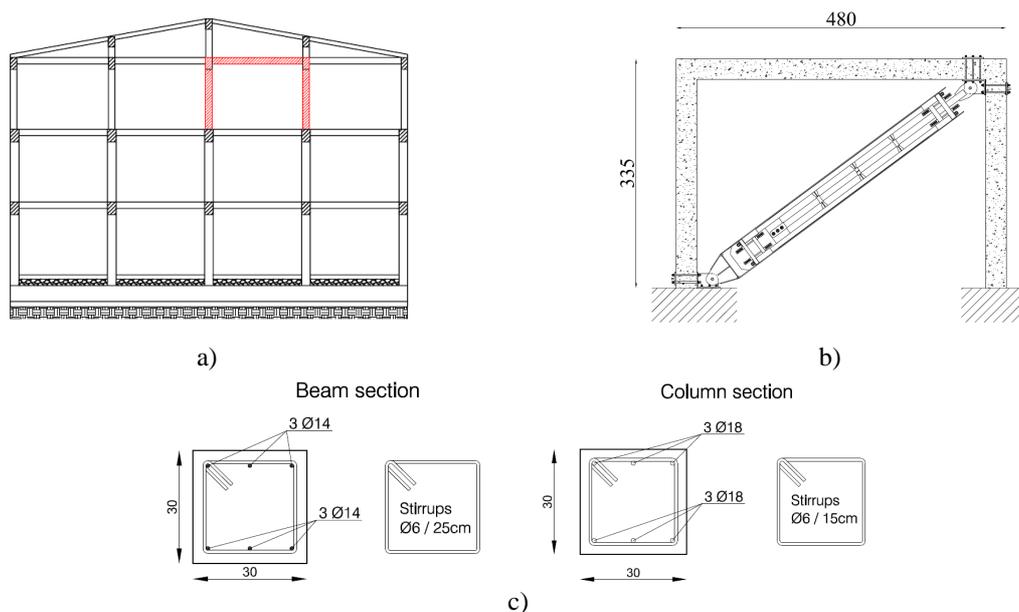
a) location of the isolated frame within the building b) main dimensions of the frame c) beam and column cross sections.
